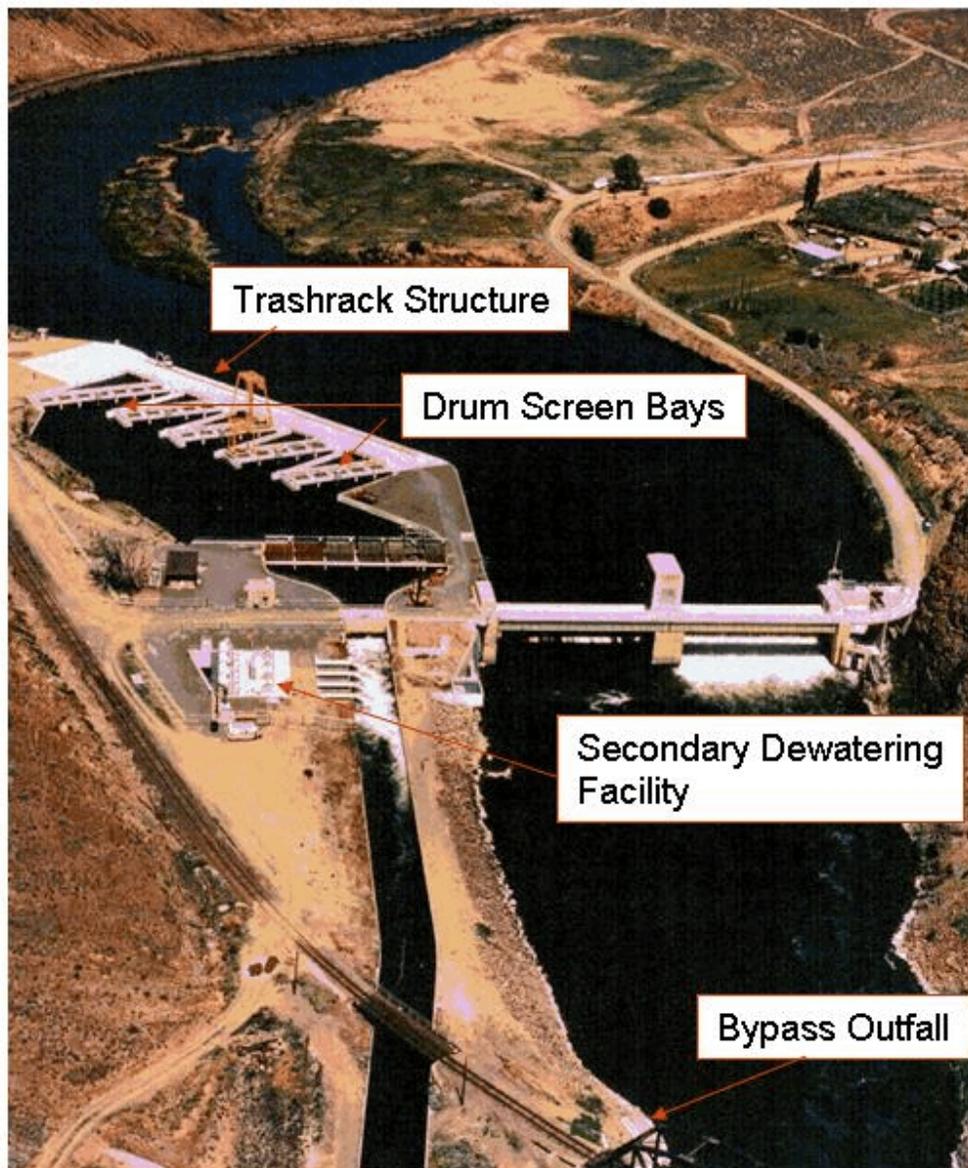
Aerial view of Roza Diversion Dam and Fish Screen Facility.
